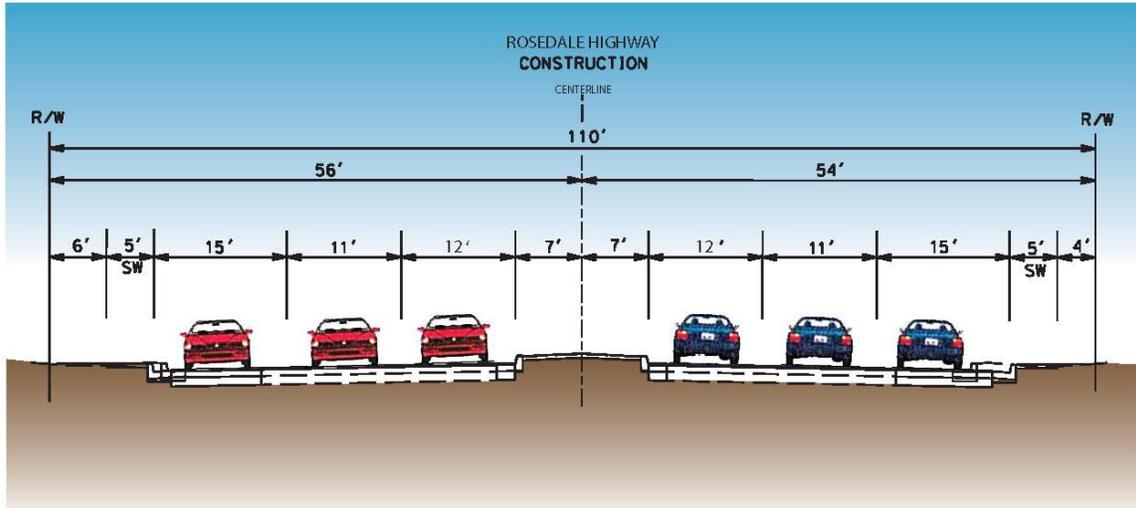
Roadway Design Features from Allen Road to Mohawk Street
